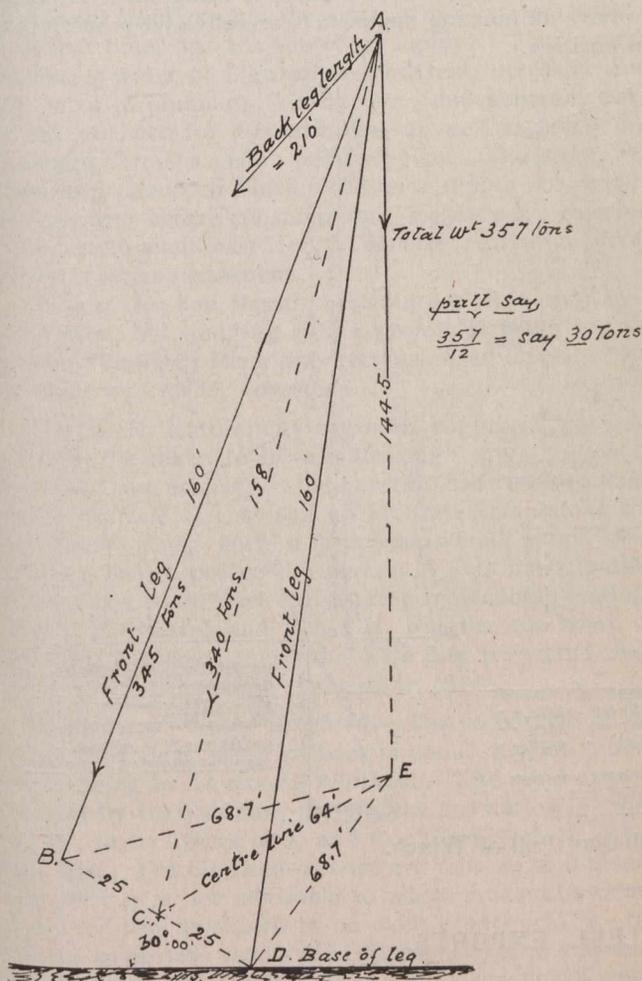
Isometric Sketch Showing Deduced Dimensions of Shear-legs.
